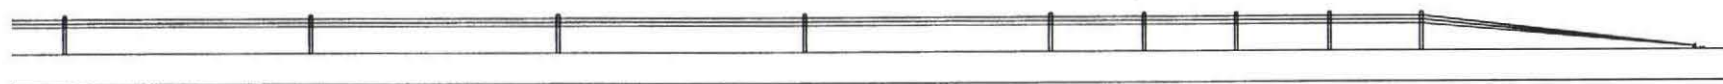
Overall Layout of Cable Guardrail to W-beam Transition (Continued).
